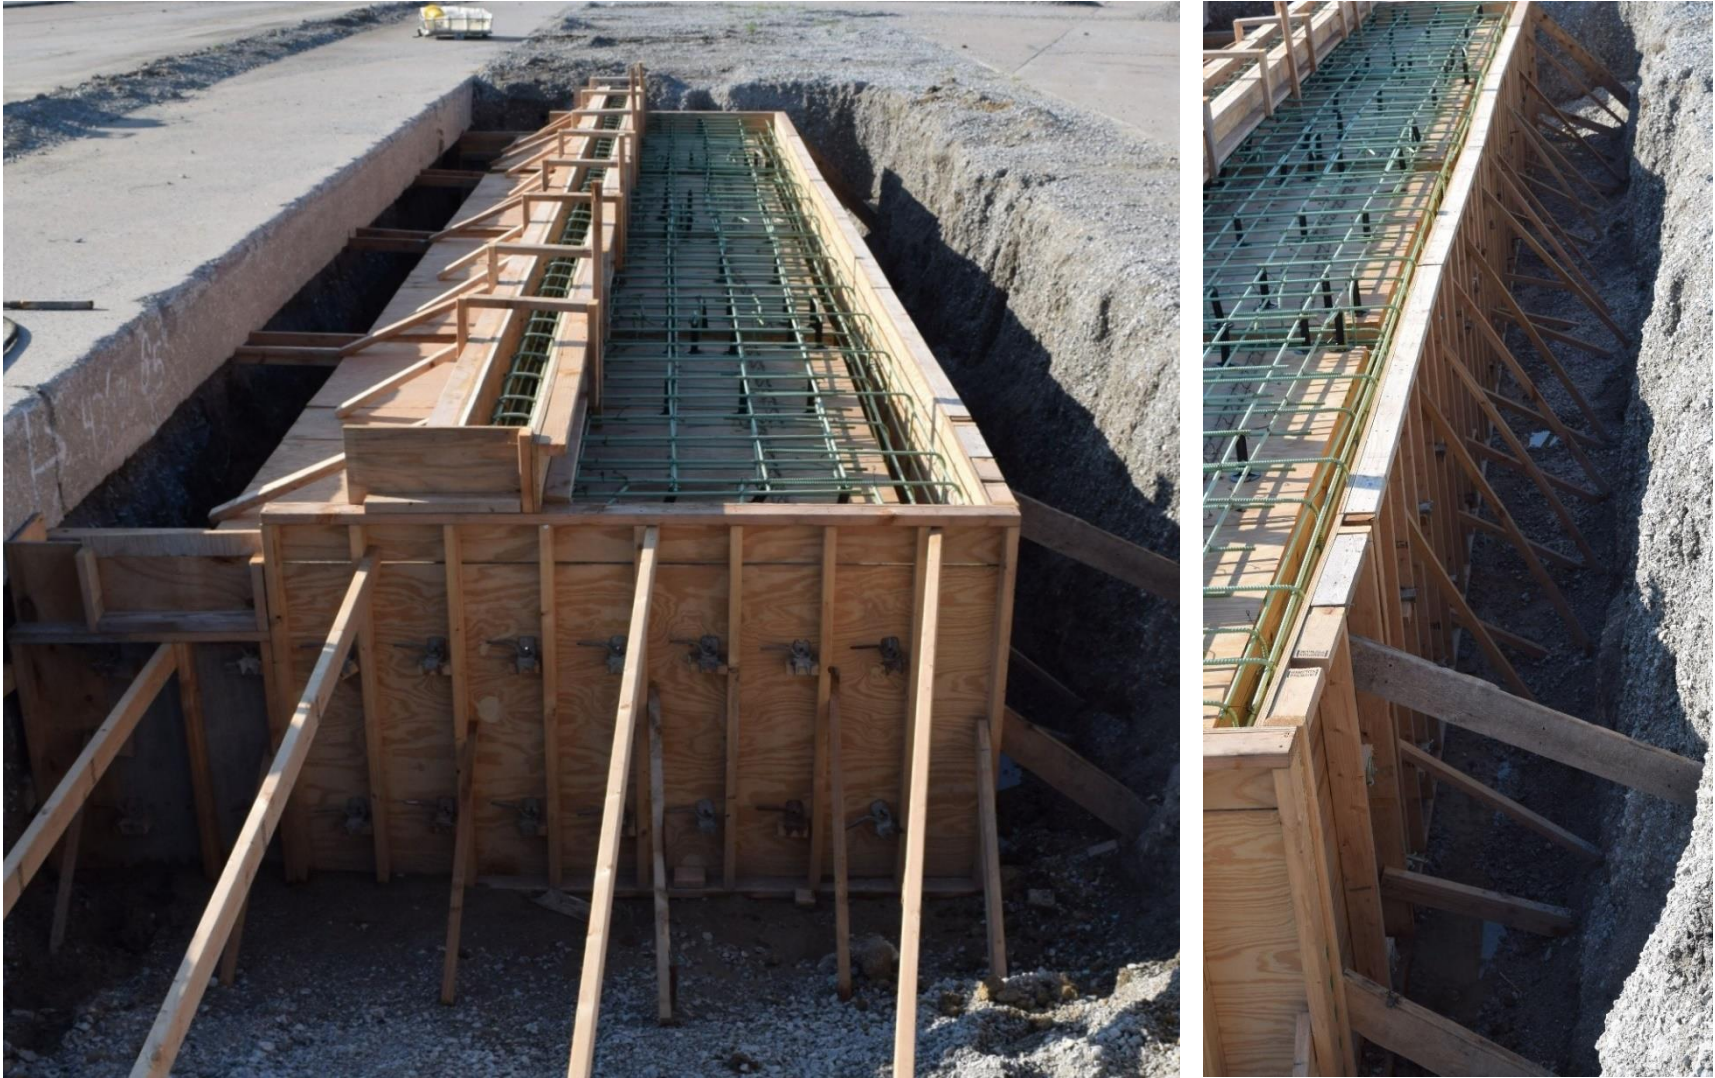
Concrete Top Slab, Headwall, and Soil Retaining Wall Framework, Test Nos. CMGS-1 and CMGS-2
